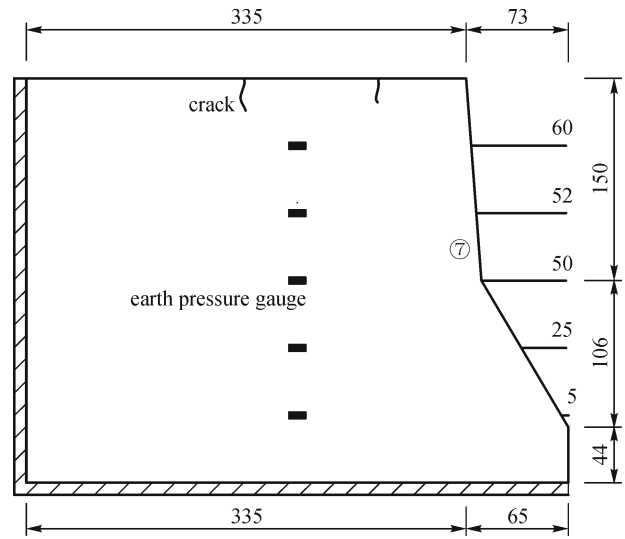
Final failure shape of A-A cross-section with bolt reinforcement in case 3 (unit: mm)
